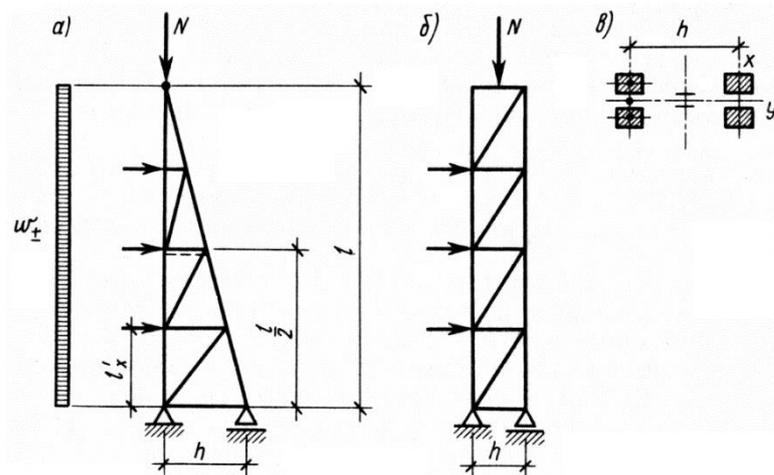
Lattice columns: a - triangular; b - rectangular; v - types of sections.
